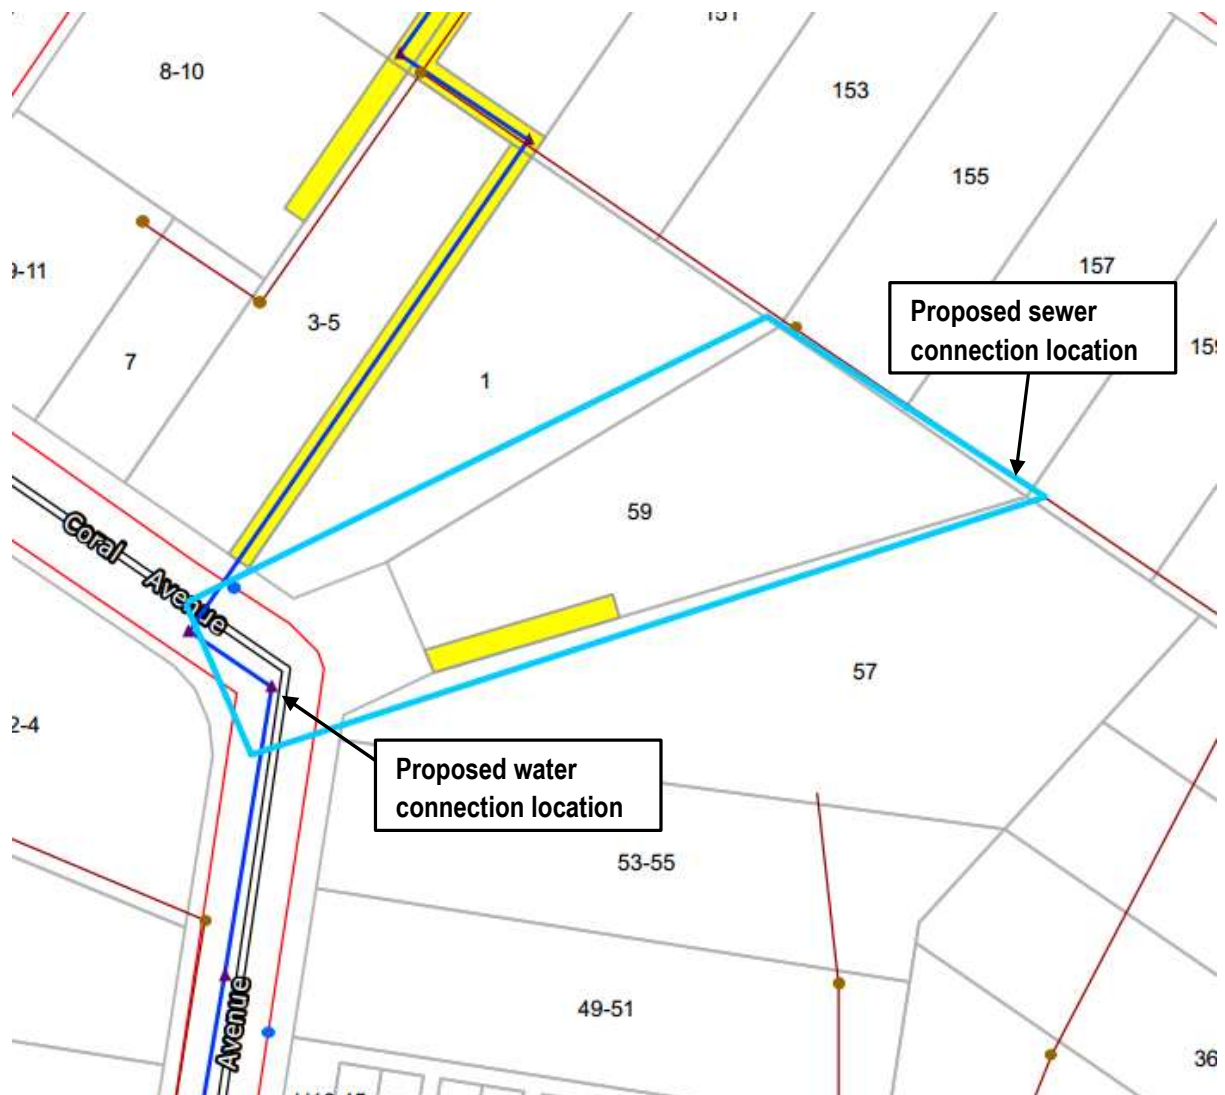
Logan Water DBYD sewer and reticulated water infrastructure plan
